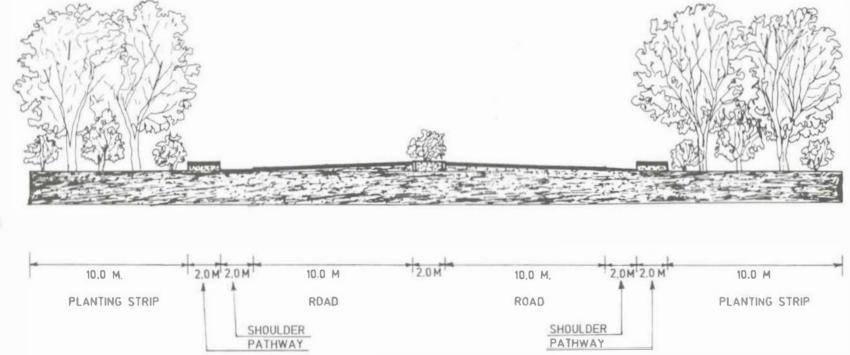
TYPICAL ROAD-SIDE PLANTATION
